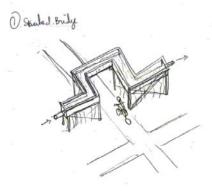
The aeration tanks can be supported on columns like a sky bridge. They can span over other structures or infrastructure. Image by author.
